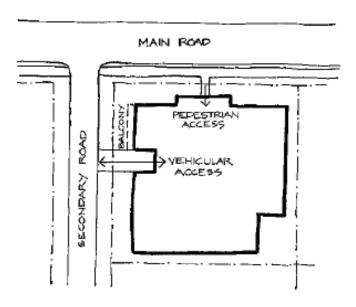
Vehicular access ways and driveways from Rocky Point Road are discouraged. Access to car parking is preferred from secondary streets or rear lanes.
